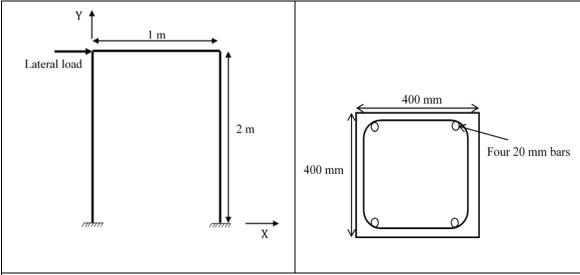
The dimensions, loading arrangement and reinforcement details of all beams and columns of the planar reinforced concrete single storey frame.
